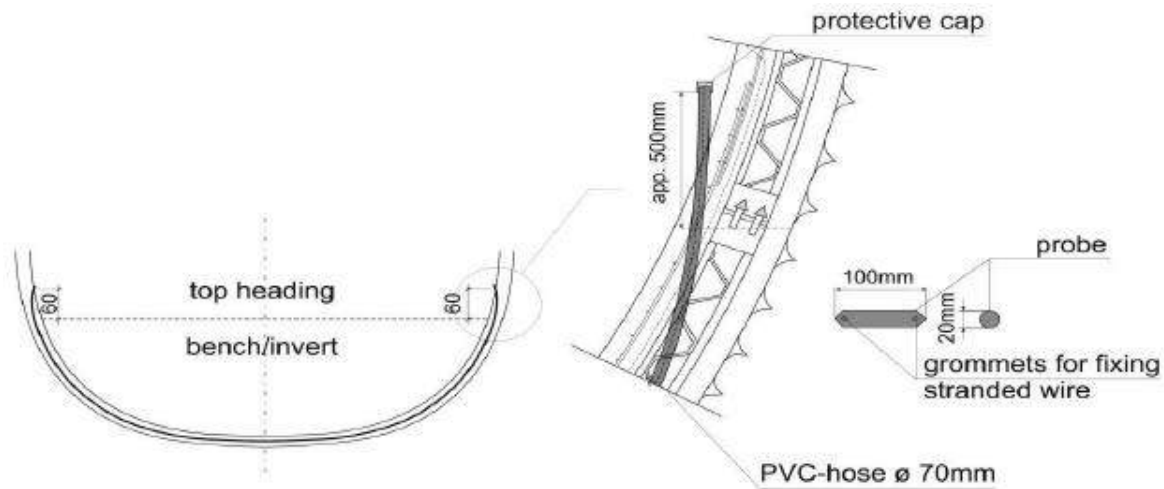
Typical invert probe (details and arrangement in cross section) [36]
